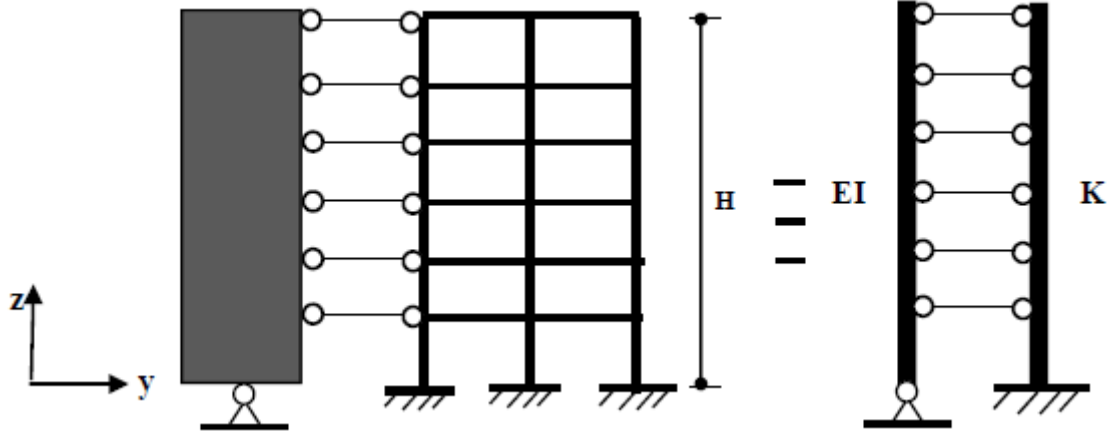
Equivalent model of frame hinged shear wall structures – Bozdogan [10]
